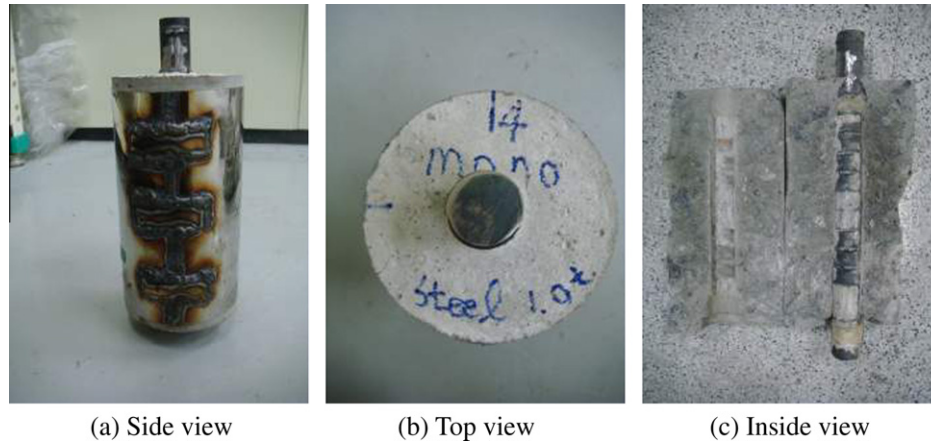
Pull-out failure mode of concrete confined using a steel wrapping jacket.
